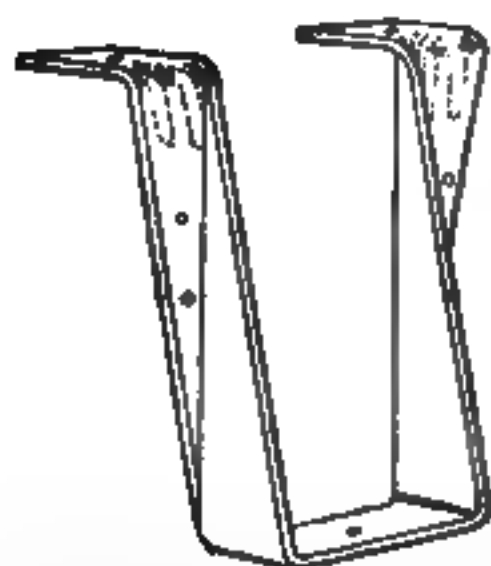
"Ideal" Wrought-steel Beam-hanger
